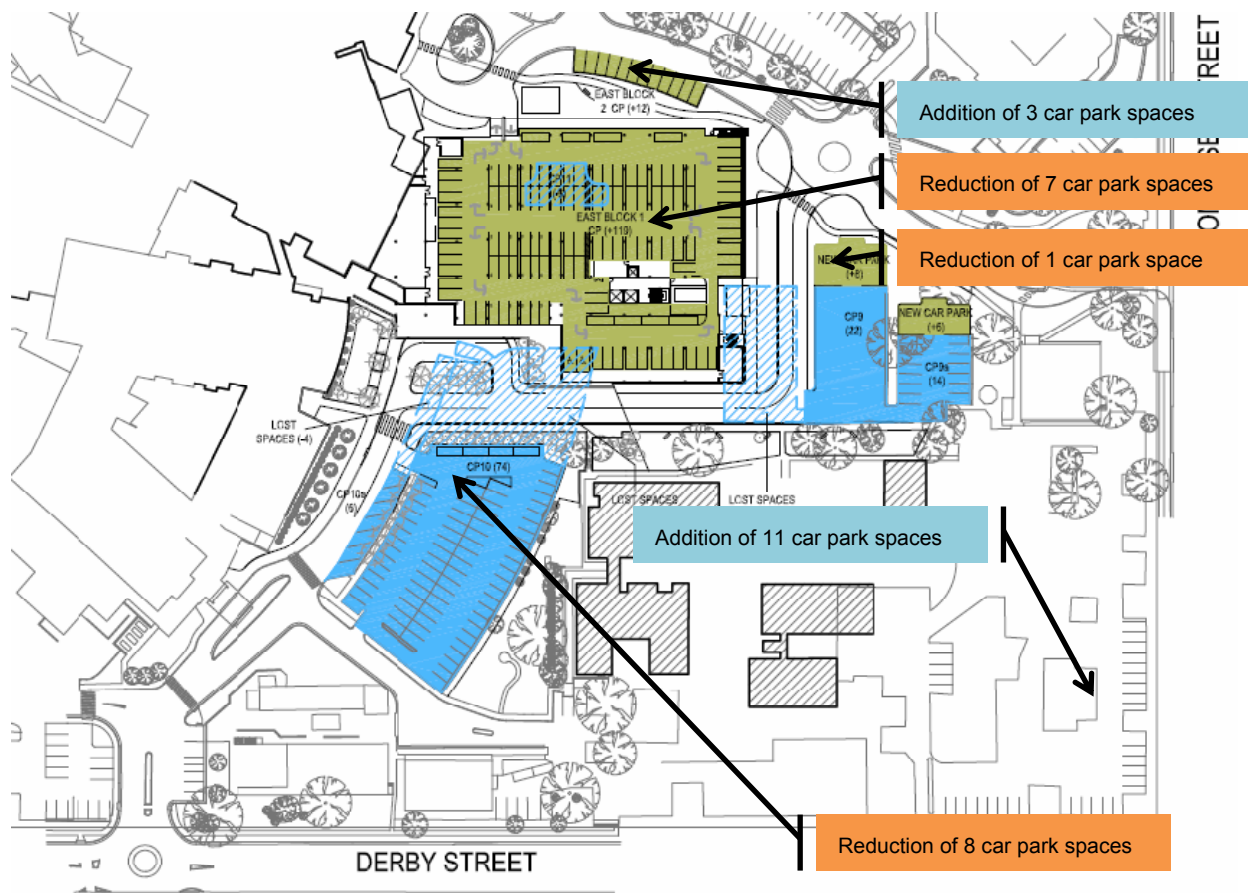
Proposed Amendment to Car Parking Plan (Source: HASSELL 2009)
